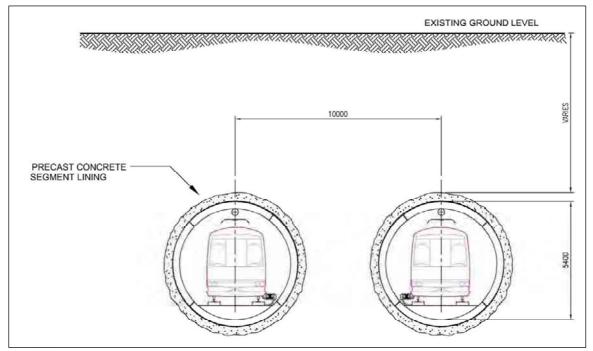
Typical Section of Bored Tunnel (Single Track)
